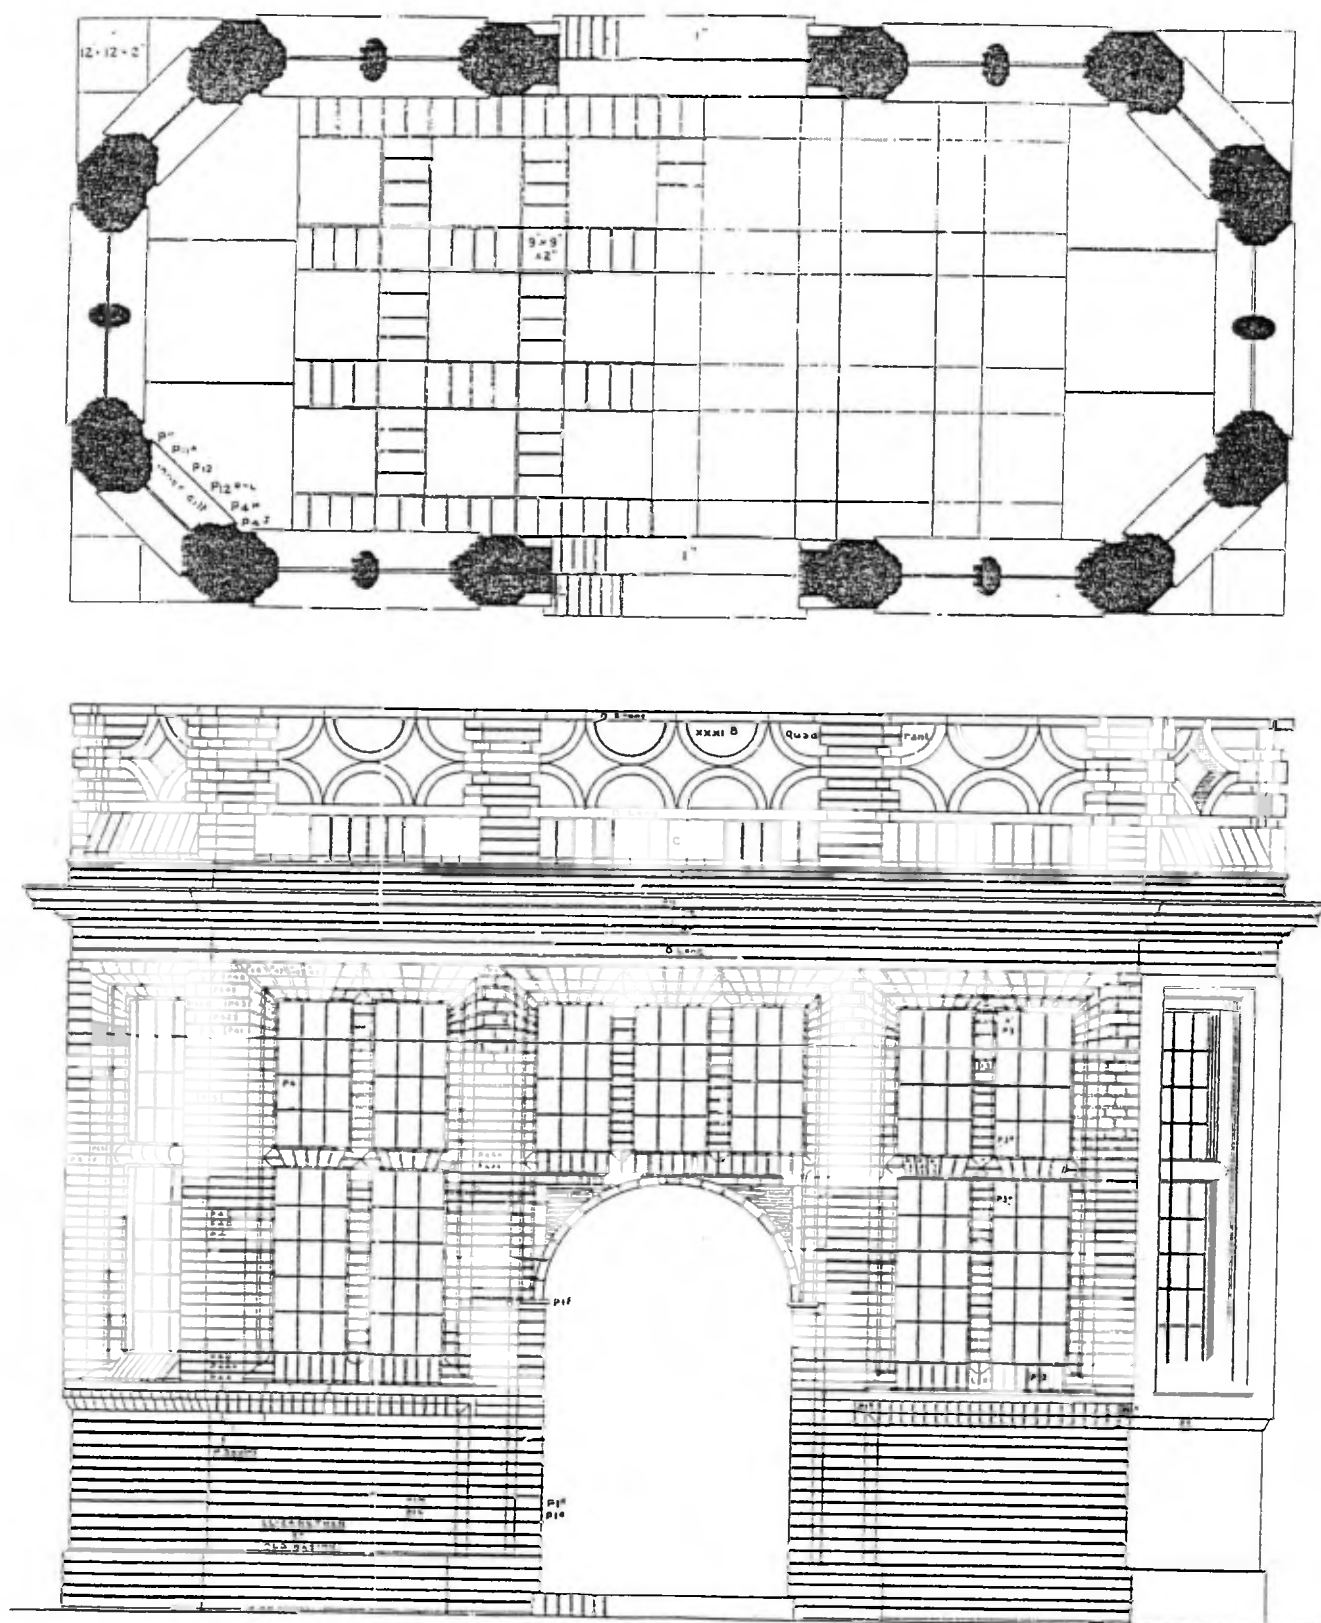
Plan and elevation of the education pavilions designed by E.L. Lutyens for the brickworks at Daneshill owned by Walter Hoare. The pavilion was exhibited at the Building Trades Exhibition 1908. The same moulds were used for the bricks used in this as were used for the bricks of the office building.
